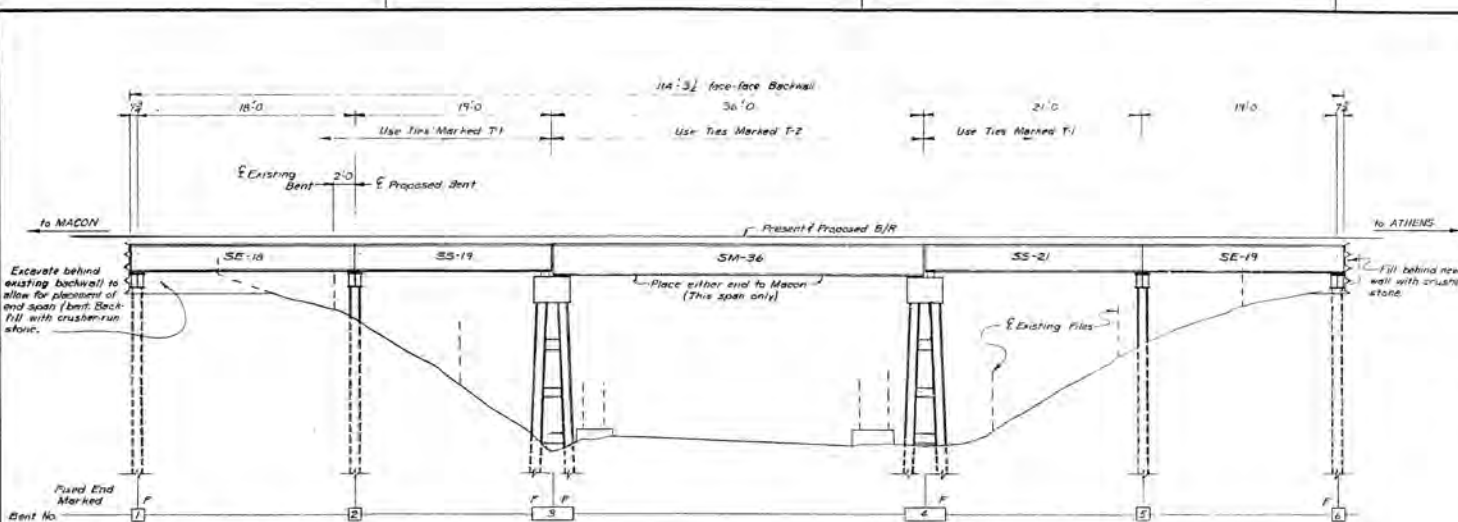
(continued): April 18, 1975 River Road Trestle Construction Drawing
